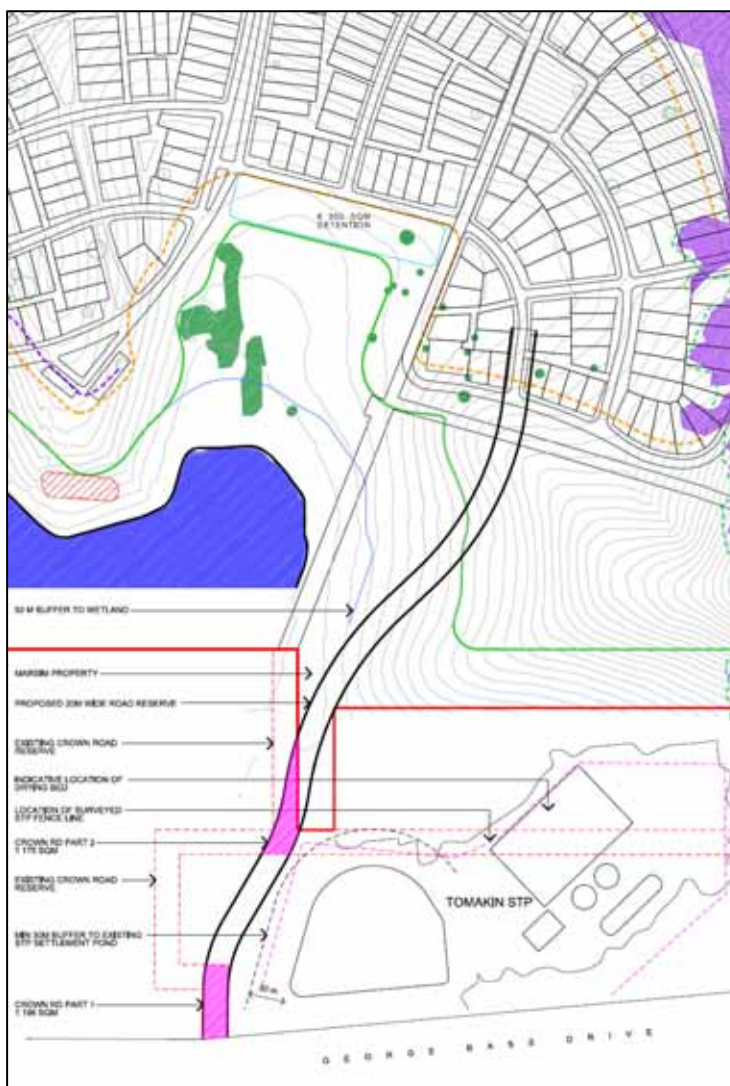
Detail of south-eastern portion of the original Concept Application plan showing the location of the new southern access road to George Bass Drive
